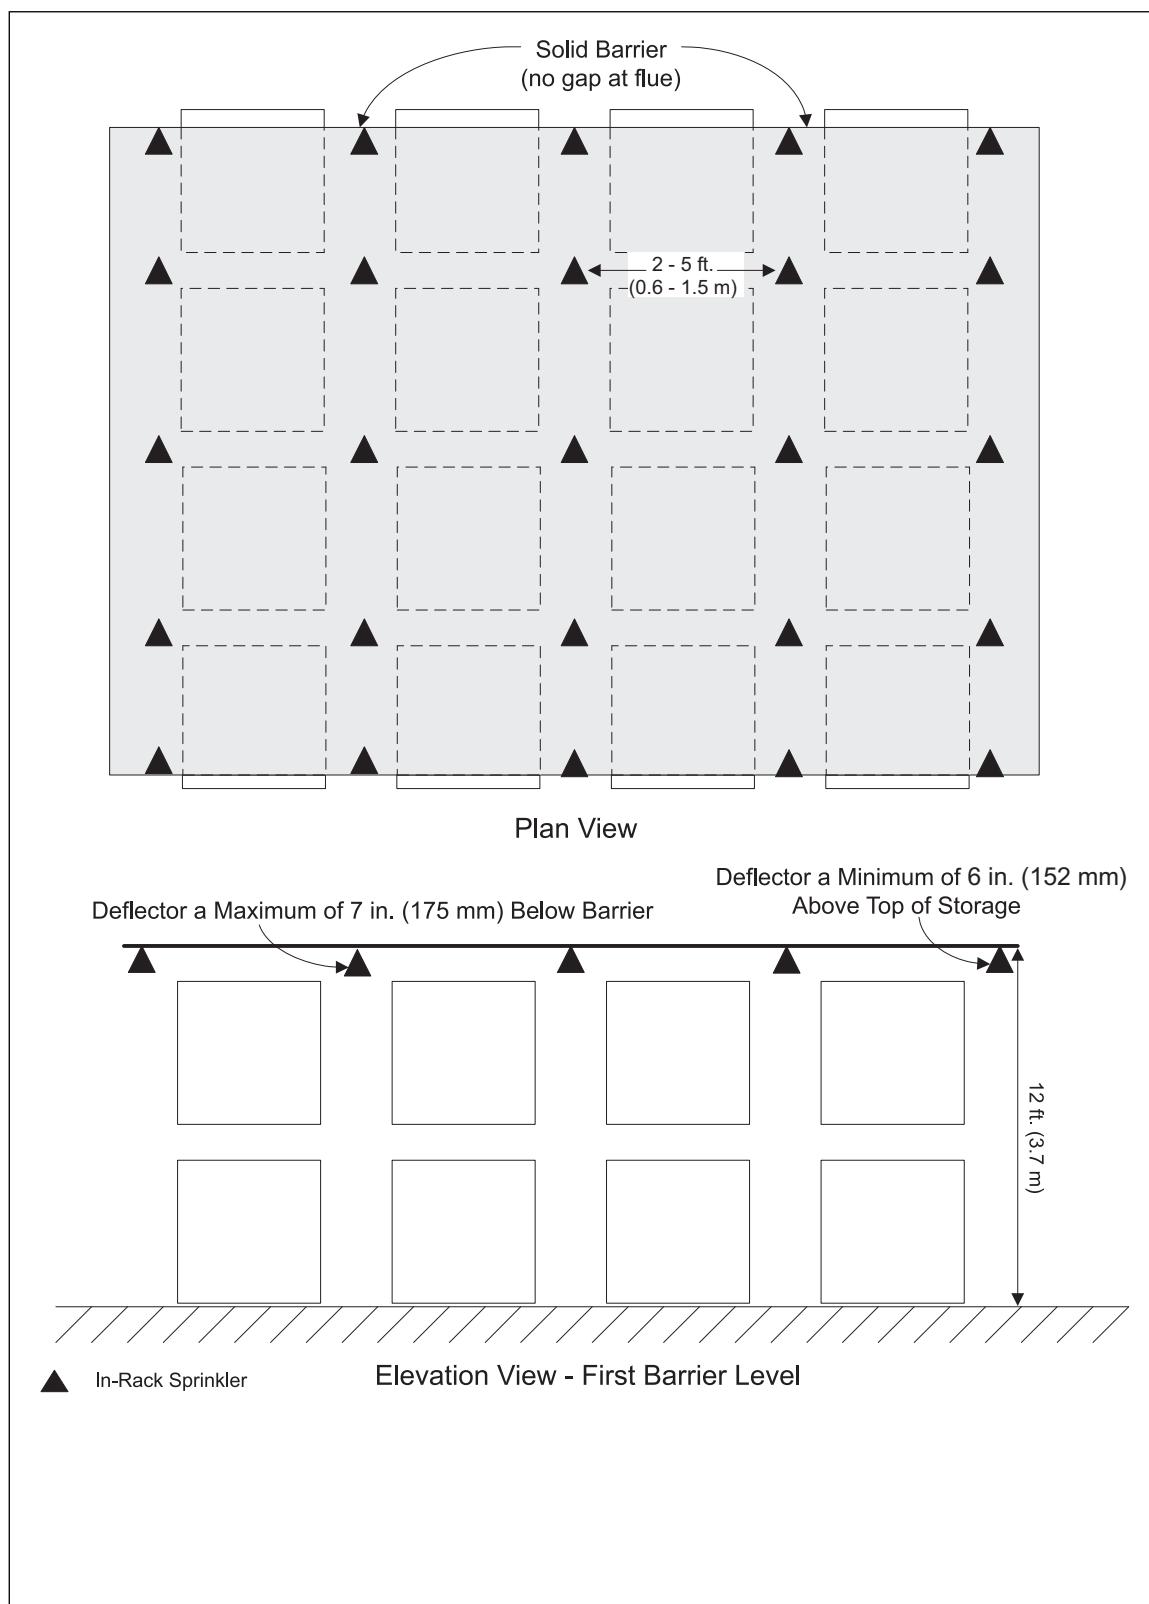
Multiple-row rack sprinkler layout: fire protection scheme A
